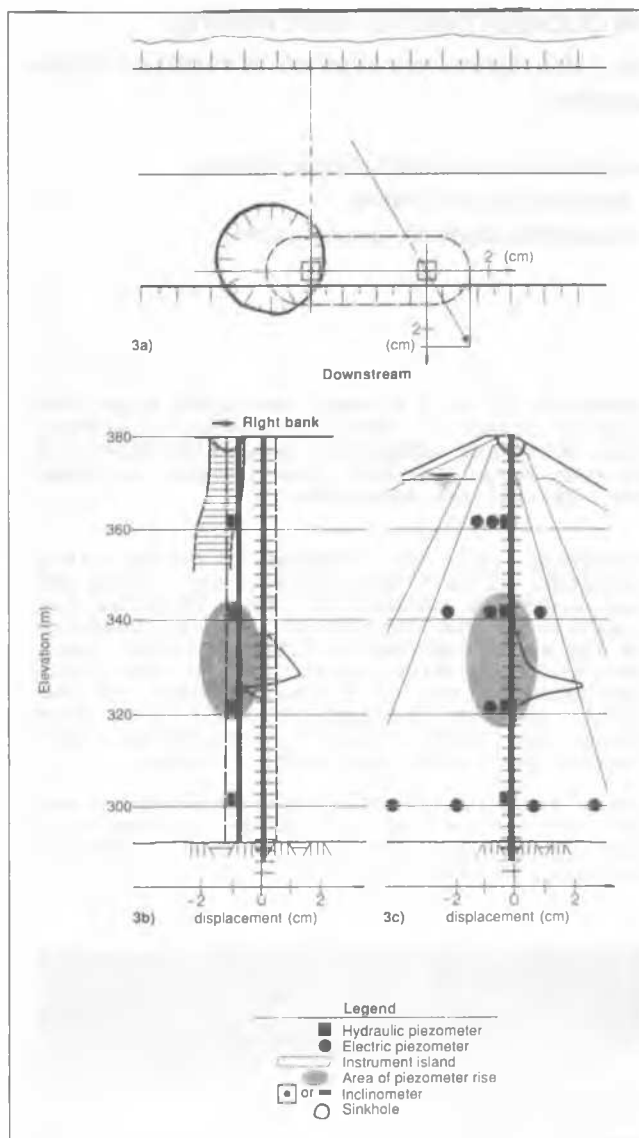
QA-8 Sinkhole - Instrument Reaction: Plane view, Longitudinal section, Transverse section.
